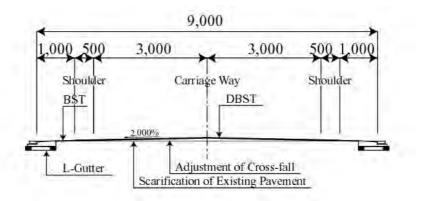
Standard Cross-Section: Taatirerei Road in Betio (1)
